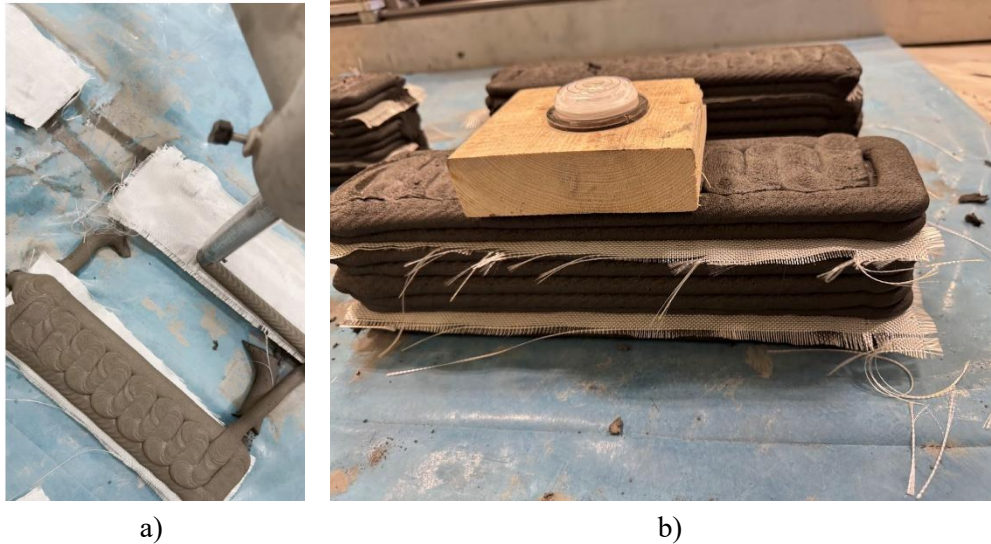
(a) Placement of fabric in 3D Printed specimens and printing specimens, (b) Checking the level for printed specimens
